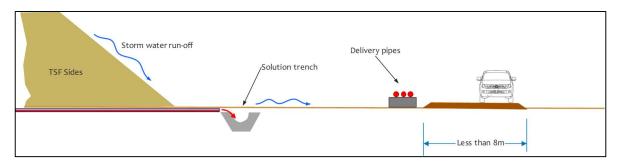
PLANNED REINSTATEMENT AND UPGRADING OF THE EXISTING SOLUTION TRENCH
